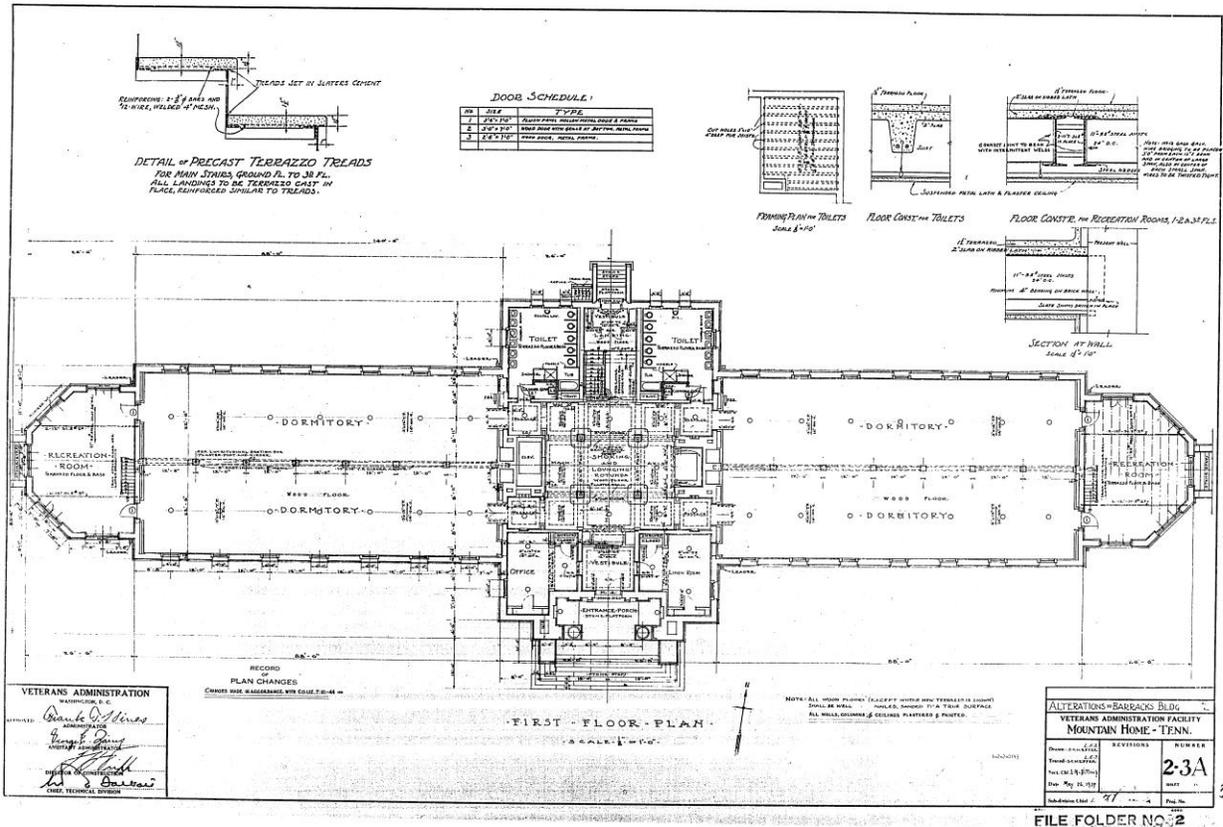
Building No. 2 First Floor Plan, (26 May 1939)
